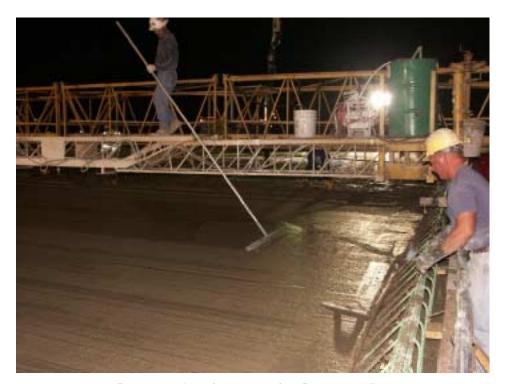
Texturing of concrete of I-75 over Fort Street
